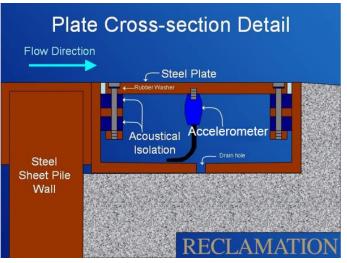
Illustration of the accelerometer mounted to the impact plate in the channel.
